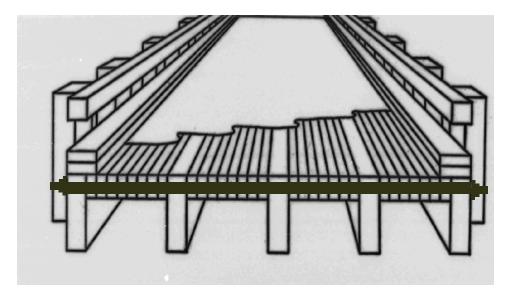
Typical Section of a Stress-Laminated Timber Tee Beam Bridge (Source: Barry Dickson, West Virginia University)
